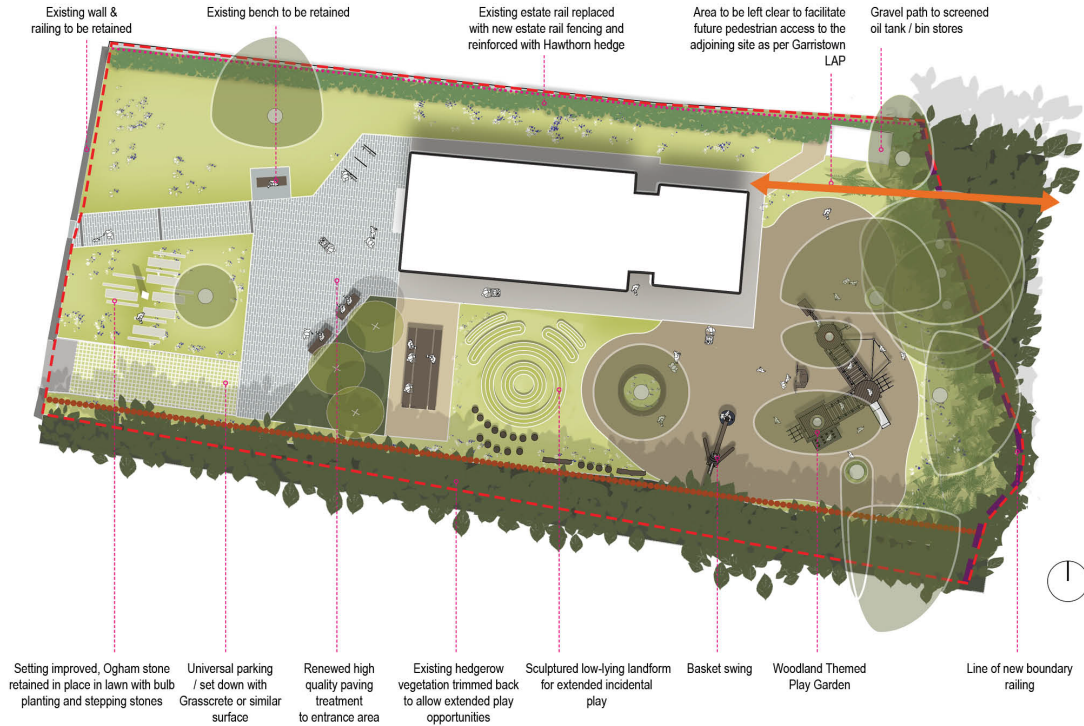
Site layout (Source: ÁIT Urbanism and Landscape)
